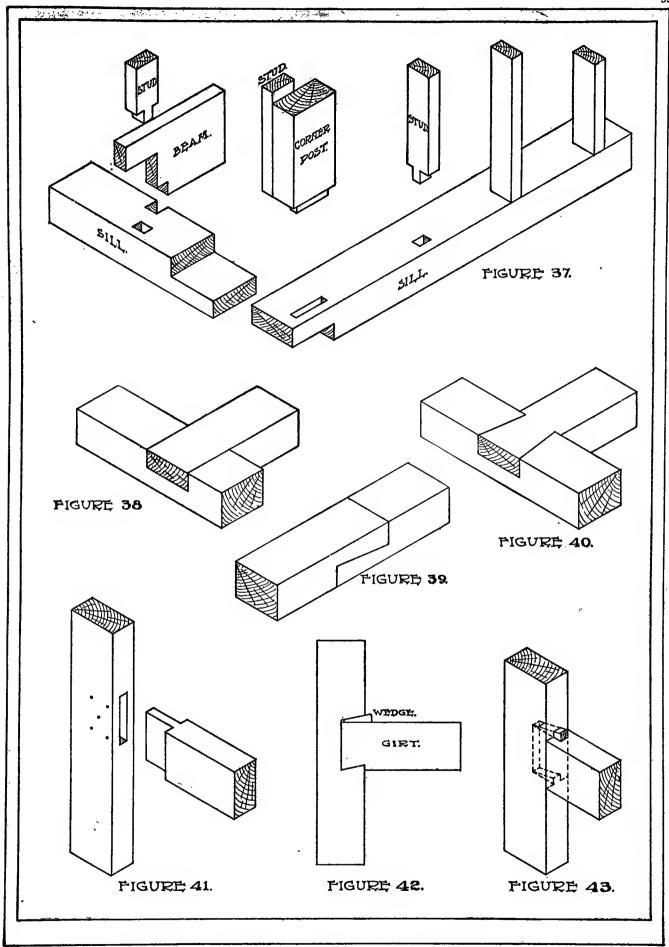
JOINTS USED IN HEAVY TIMBER FRAMING
